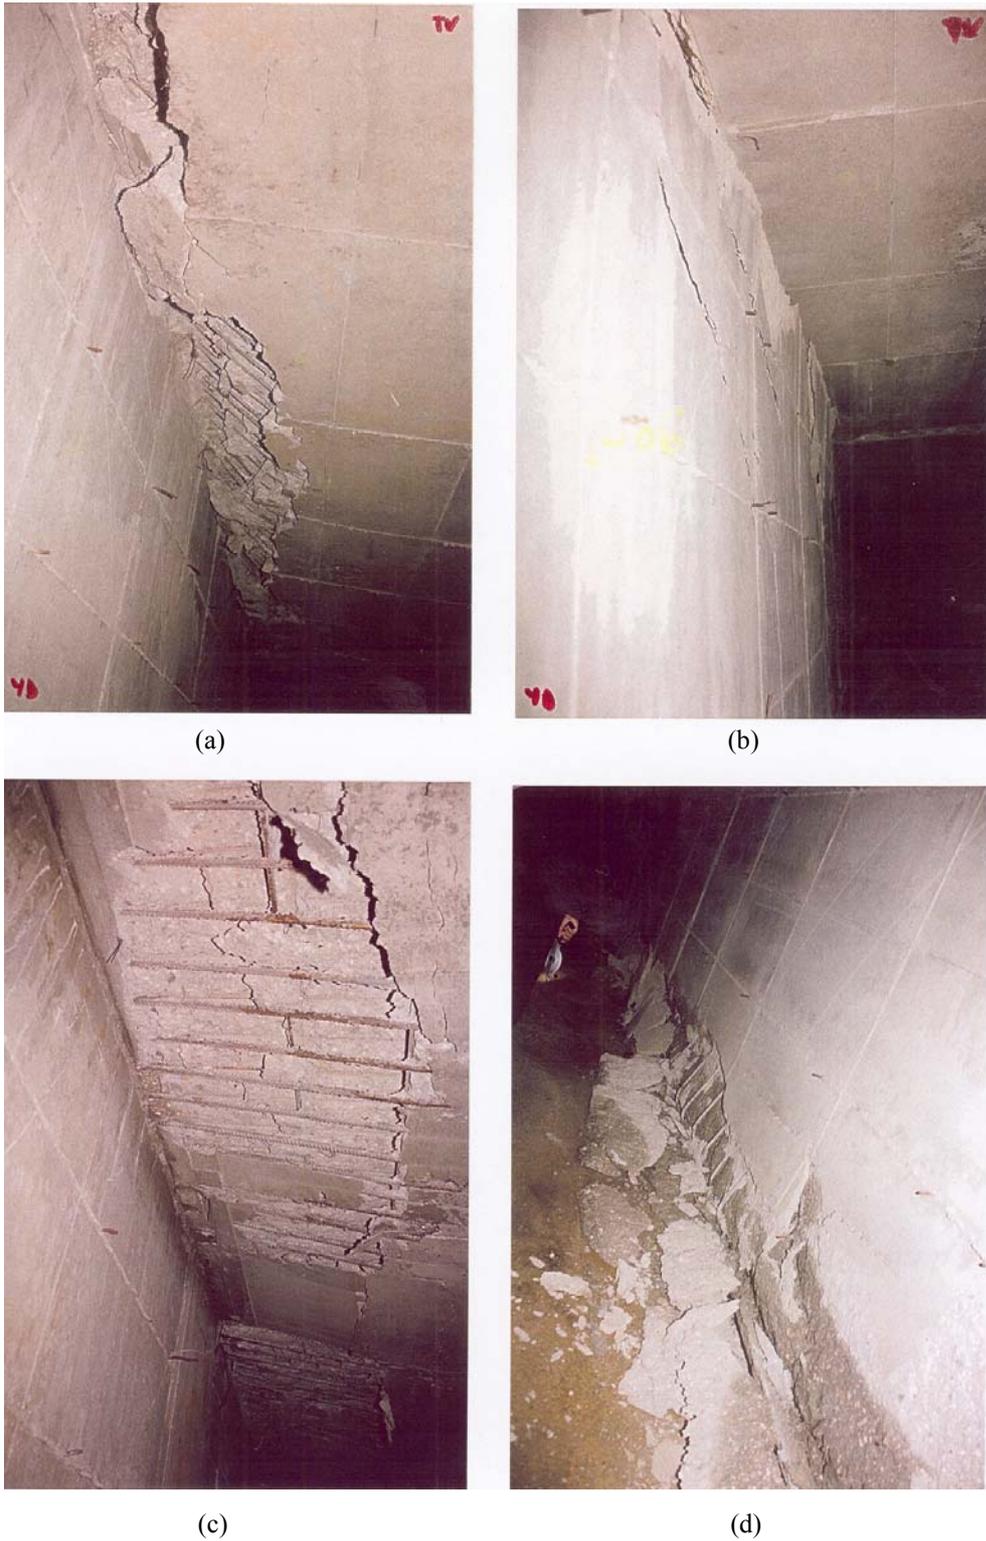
Locations of deformations occurred in the culvert (a) upper-left roof, (b) upper-left wall, (c) upper-left wall, (d) lower-right wall
